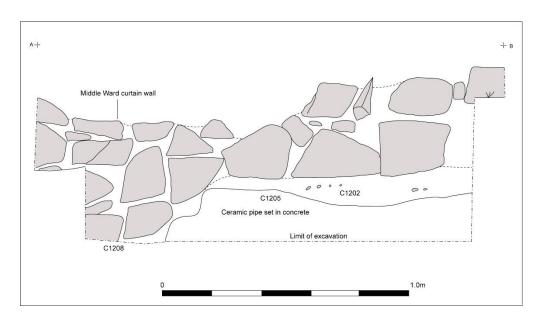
North-facing elevation across the southern end of Trench 12 showing external face of the Middle Ward curtain wall and 19th century ceramic service pipe C. 1205.
